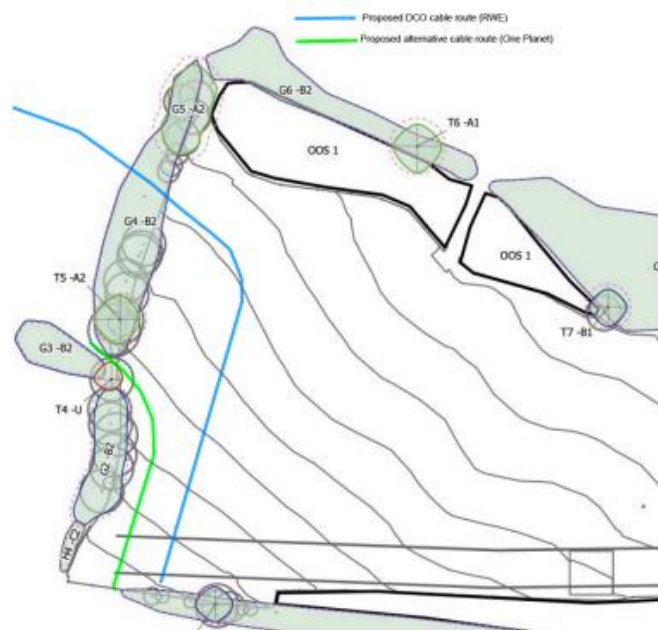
Excerpt from the Tree Survey Plan illustrating the RWE proposed cable route and alternative One Planet proposed cable route
